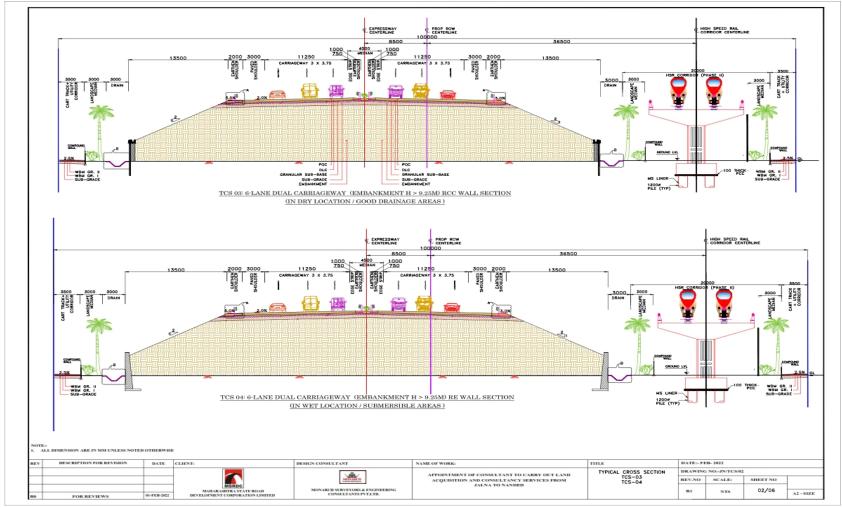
B: (Typ.) Cross Section of Proposed Alignment
